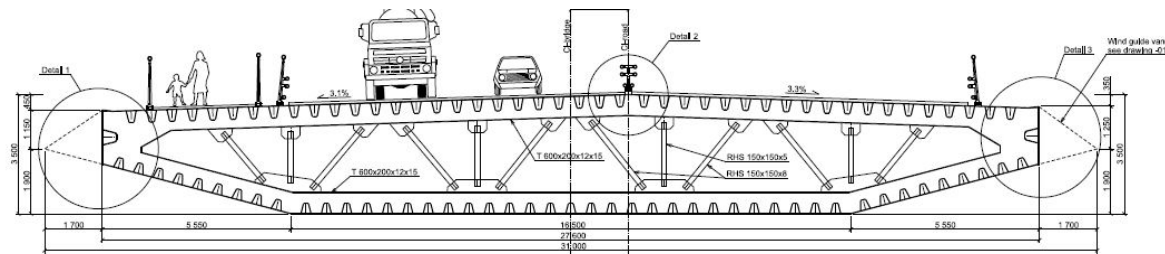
General cross section of the bridge girder. From: (Norconsult AS, 2017a)
